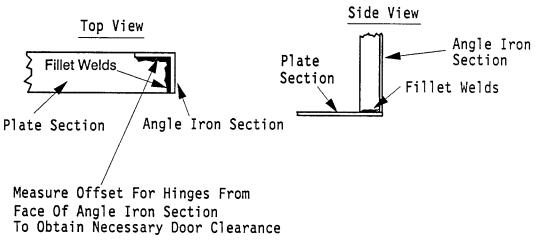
Fabricated Door Frame for Overpressure Door Repair.
